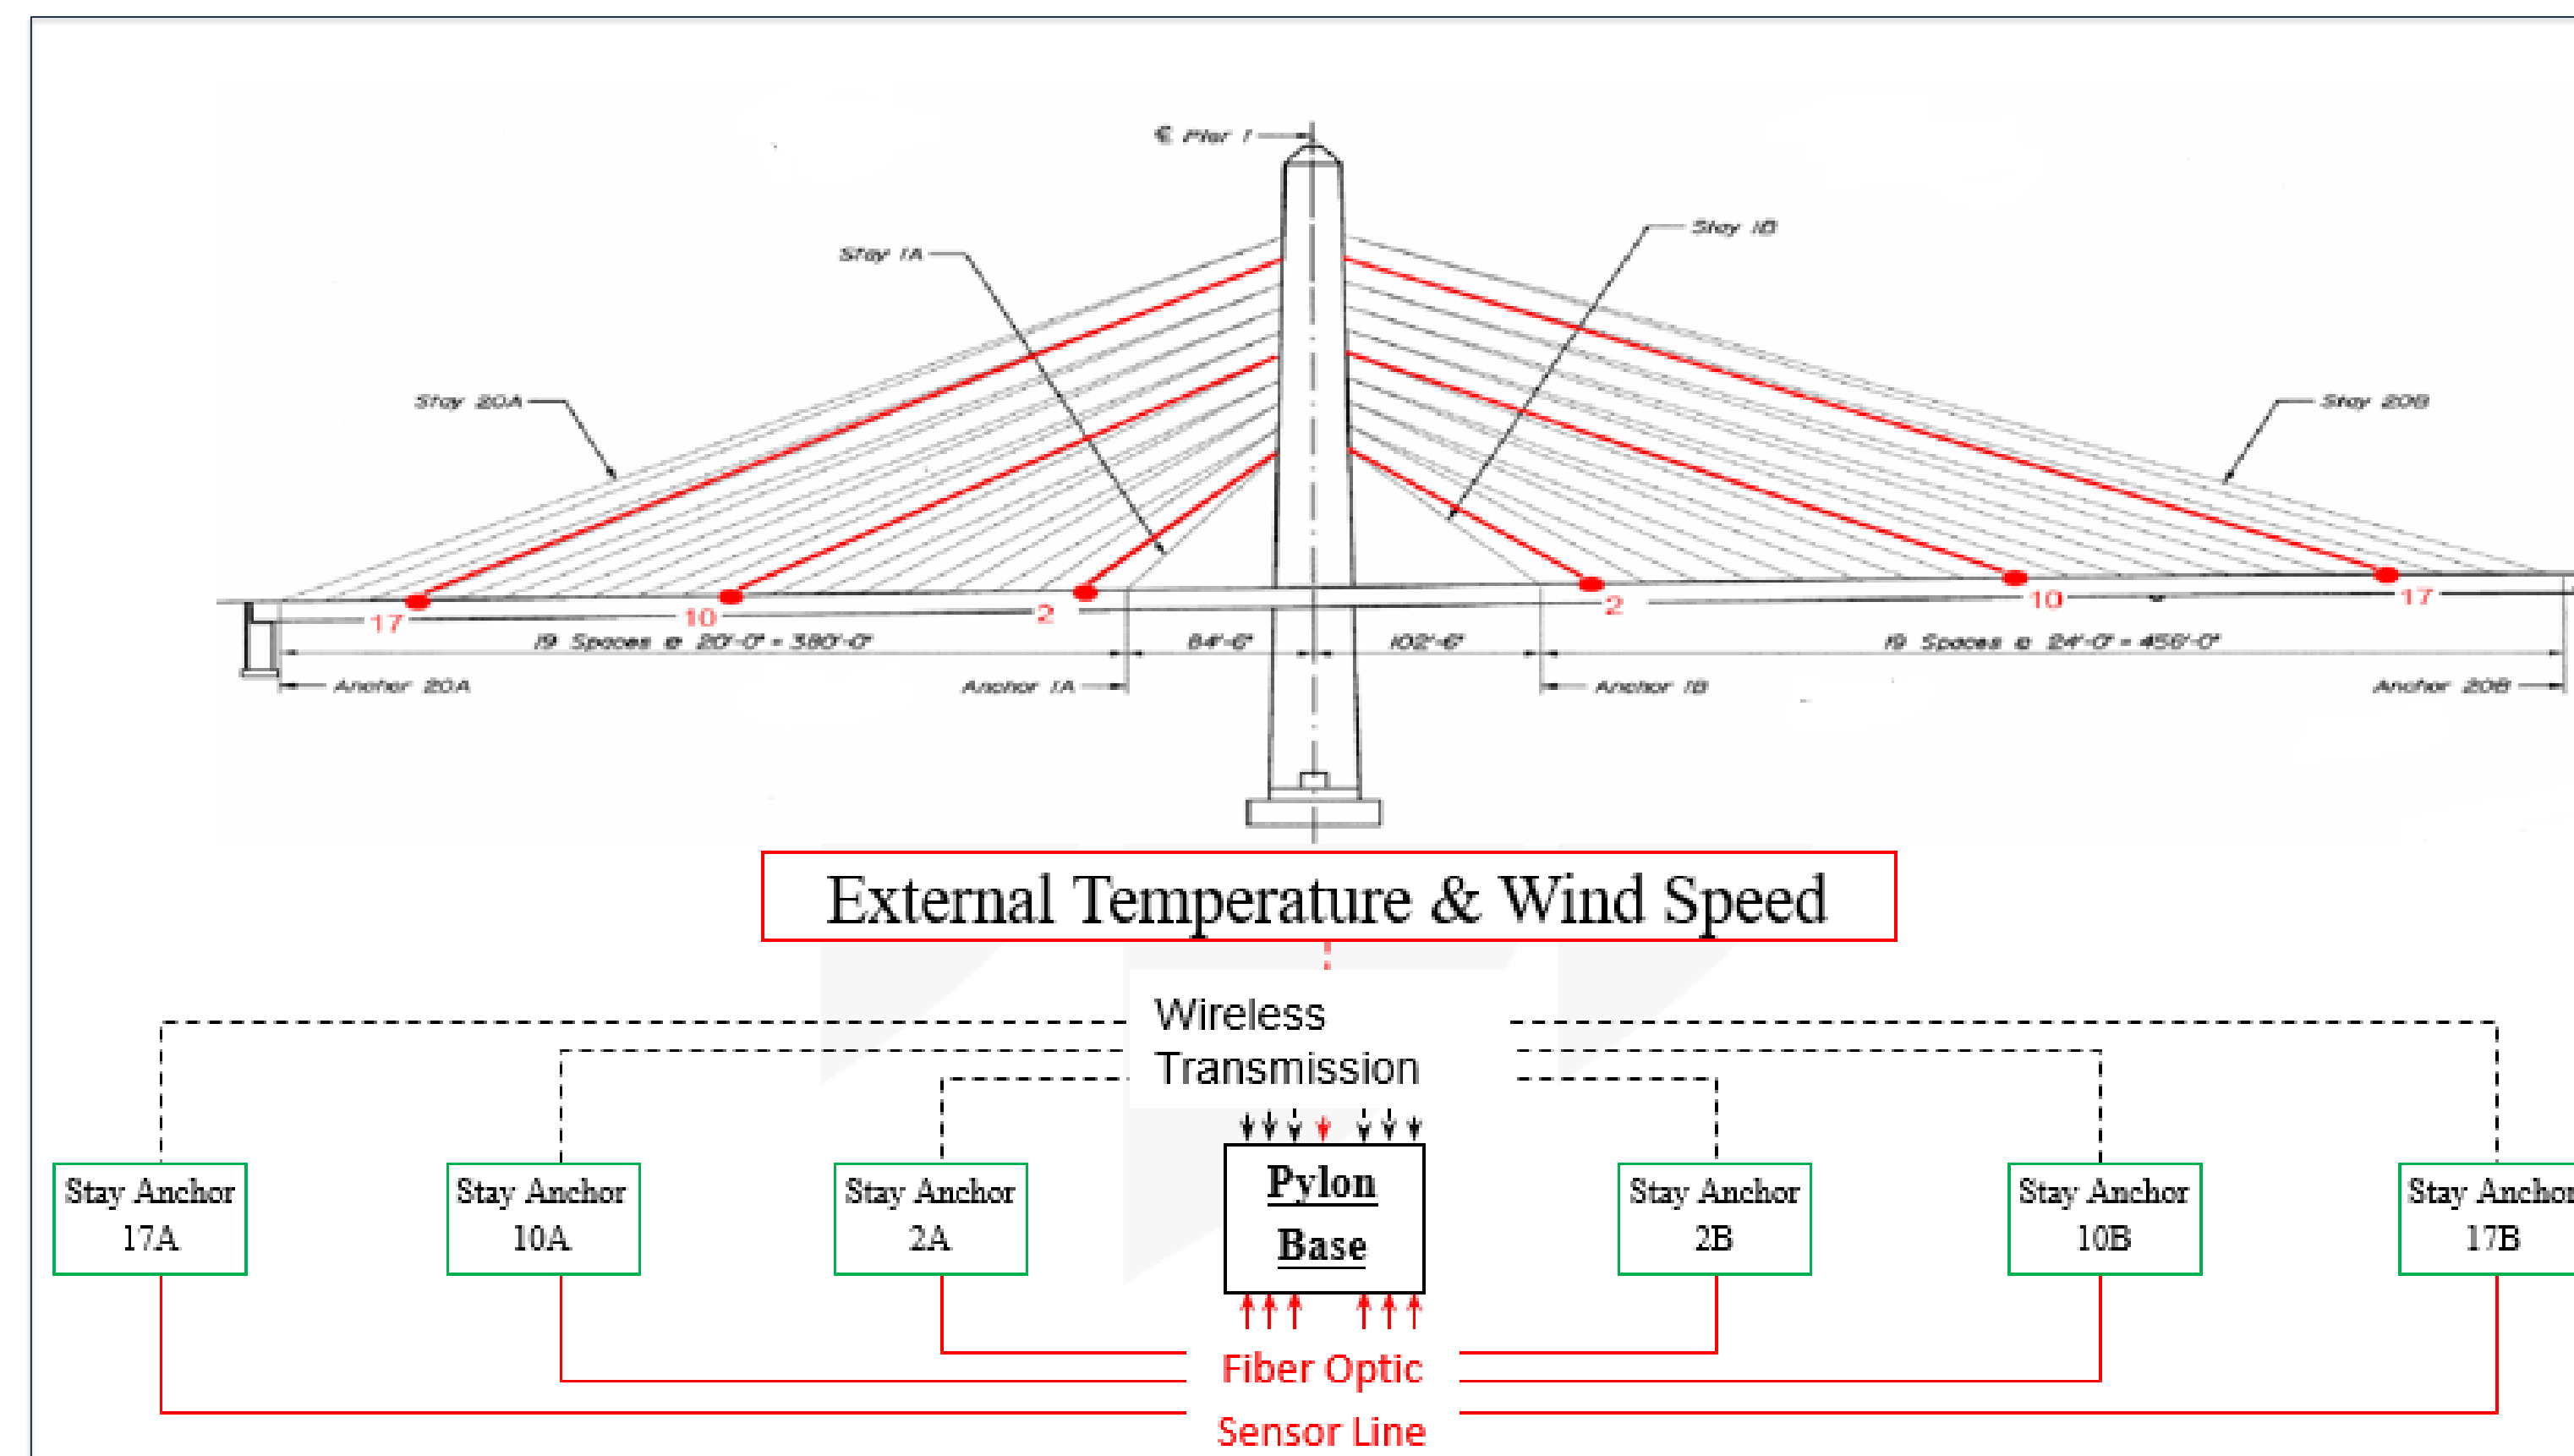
Layout of CFCCs in PNB and Proposed data acquisition system layout
